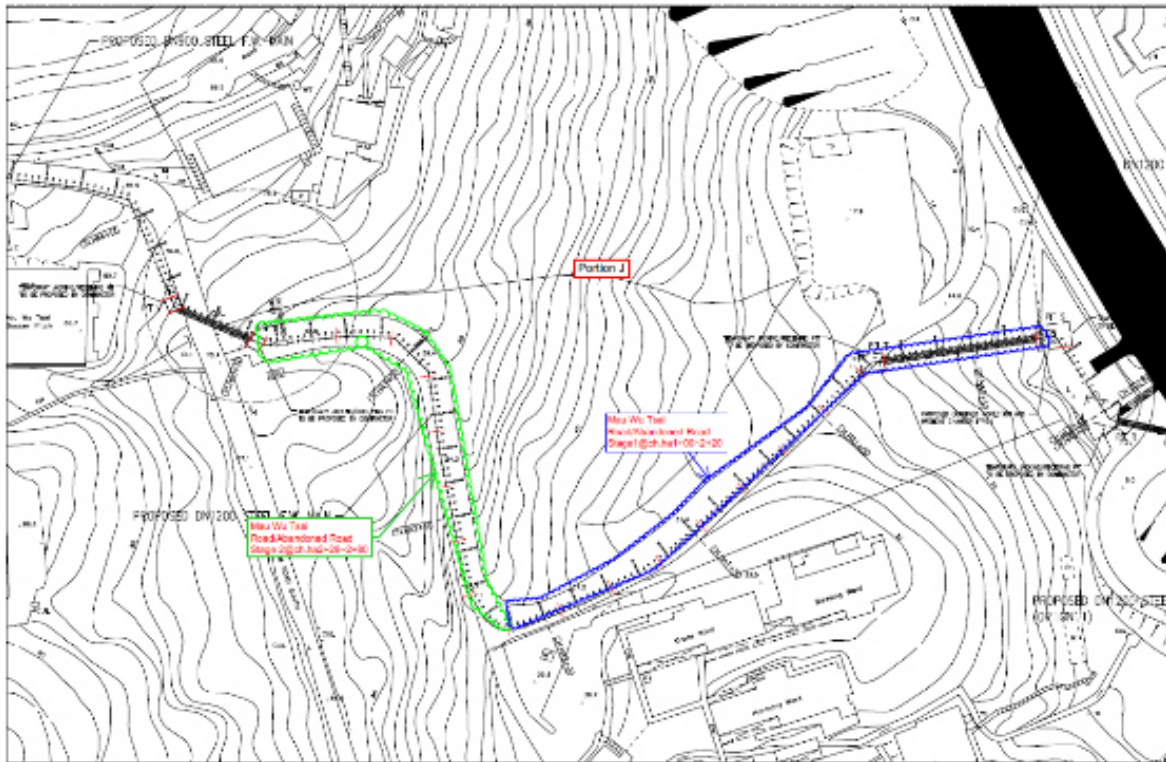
Location Plan for Mau Wu Tsai 2 & 3
